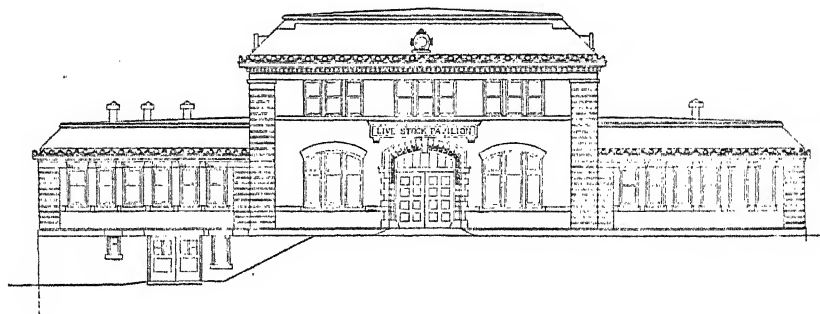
North elevation, live stock building, Minnesota College of Agriculture.
